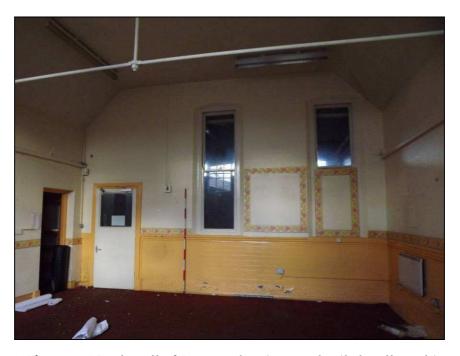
North wall of Room 7 showing partly tiled walls and internal windows (Scale = 2m)
